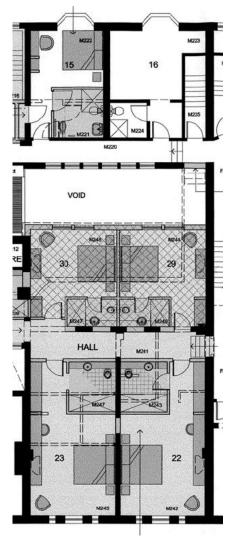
139–141 George Street, second floor plan, development application 2009. Source: PMNSW Drawing ROX-410-DA-0028-CP.
